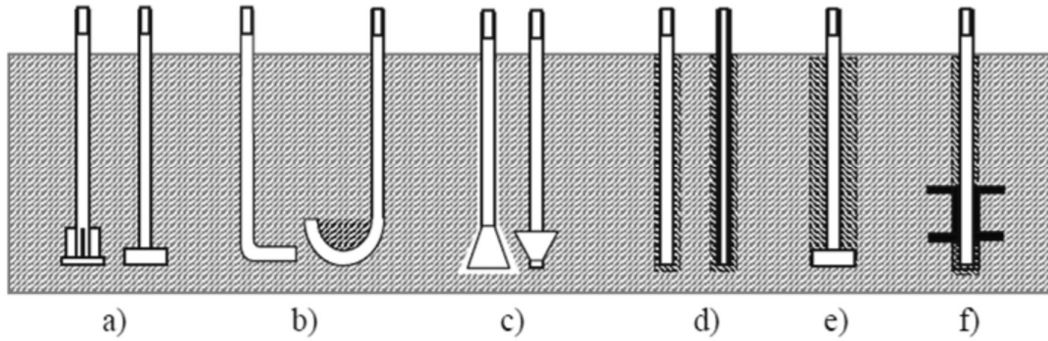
Types of anchor bolts a) cast-in-situ anchor bolts, b) hooked bars, c) undercut anchor bolts, d) bonded anchor bolts; e) grouted anchor bolts, f) anchoring to grillage beams
